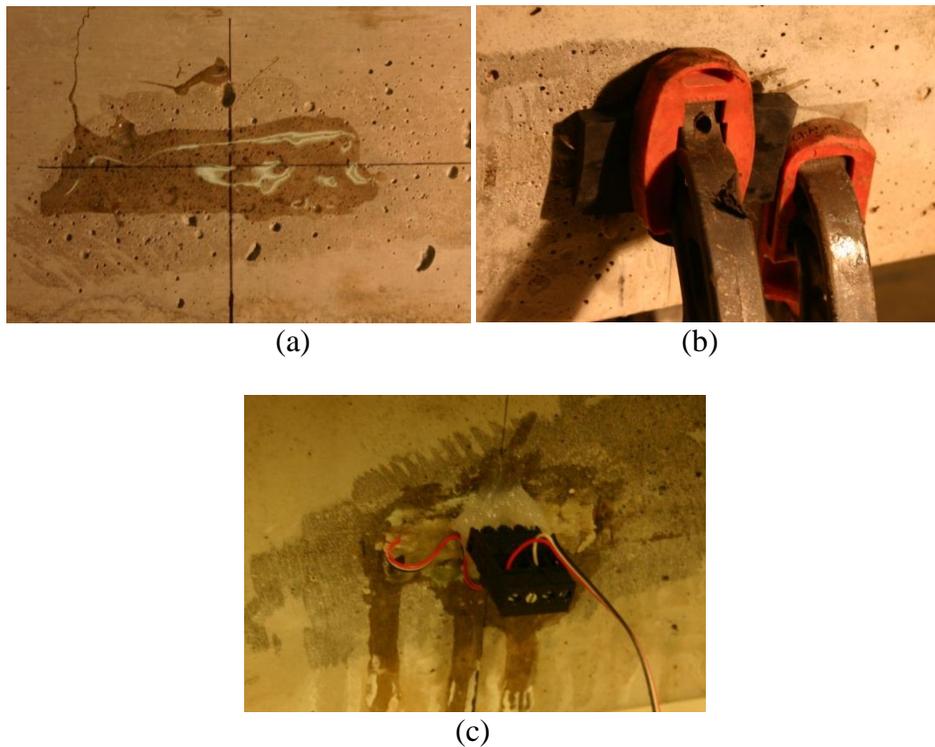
a) AE-10 Applied to Surface with Alignment Marks, b) Gage Applied and Clamped in Place, c) Completed Gage with Connection
